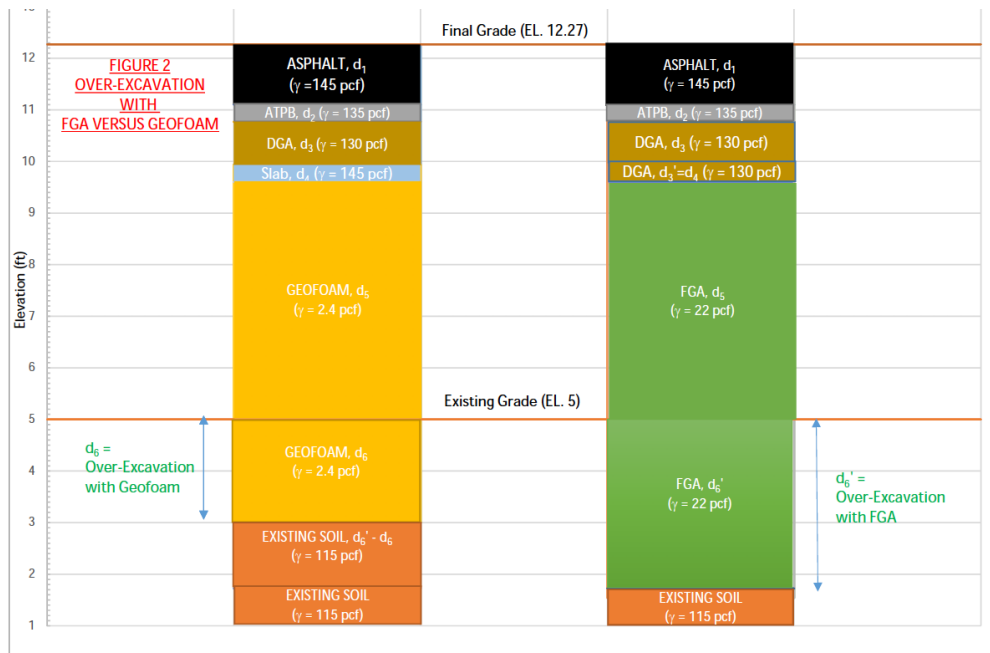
Cross Section including Geofoam (Left) and FGA (Right)
